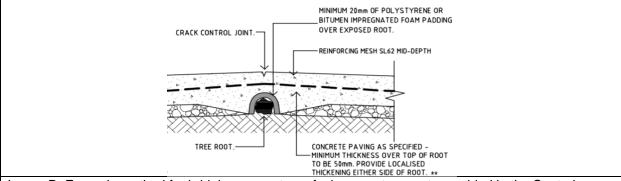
Image D: Example method for bridging concrete surfacing over tree roots provided in the Canterbury Bankstown Council standard drawings.⁸
